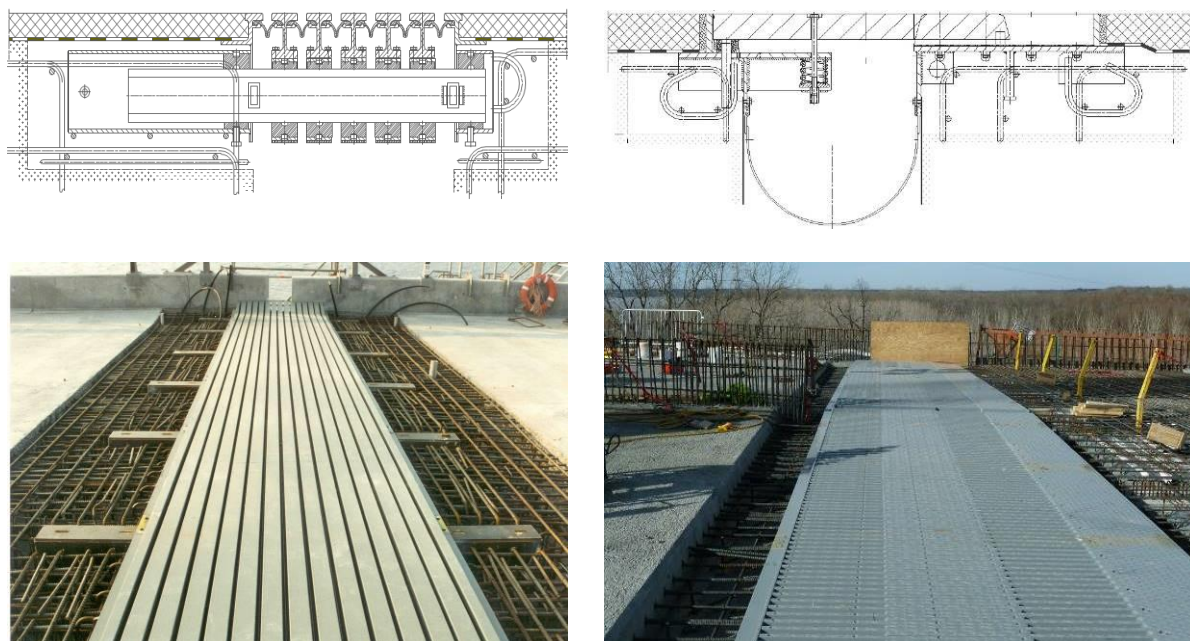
Connection of a bridge's expansion joints to the main structure by concreting allows a great degree of tolerance in terms of positioning, with the joint simply lifted into an oversized recess, as shown by these cross section sketches and photos (Left: Modular joints. Right: Sliding finger joints).
